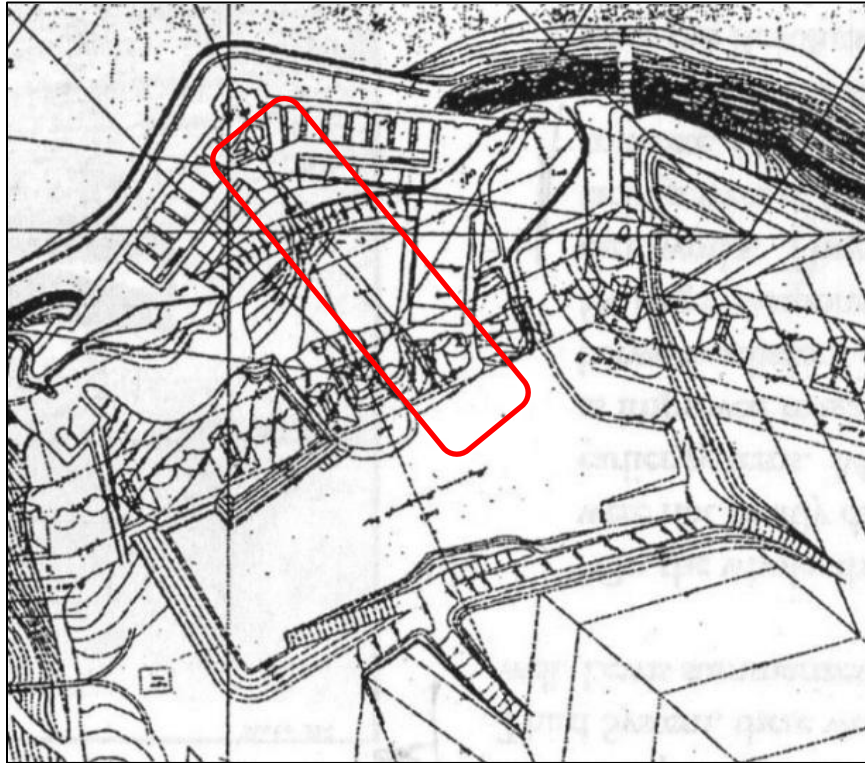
Detail of 'Plan of Willets Point, Eastern Entrance to N.Y. Harbor. Showing modifications proposed by the Board of Engineers for Fortifications, September 1869', proposed tunnel is outlined in red. (NARA RG 77 Drawer 35 Sheet 46)
